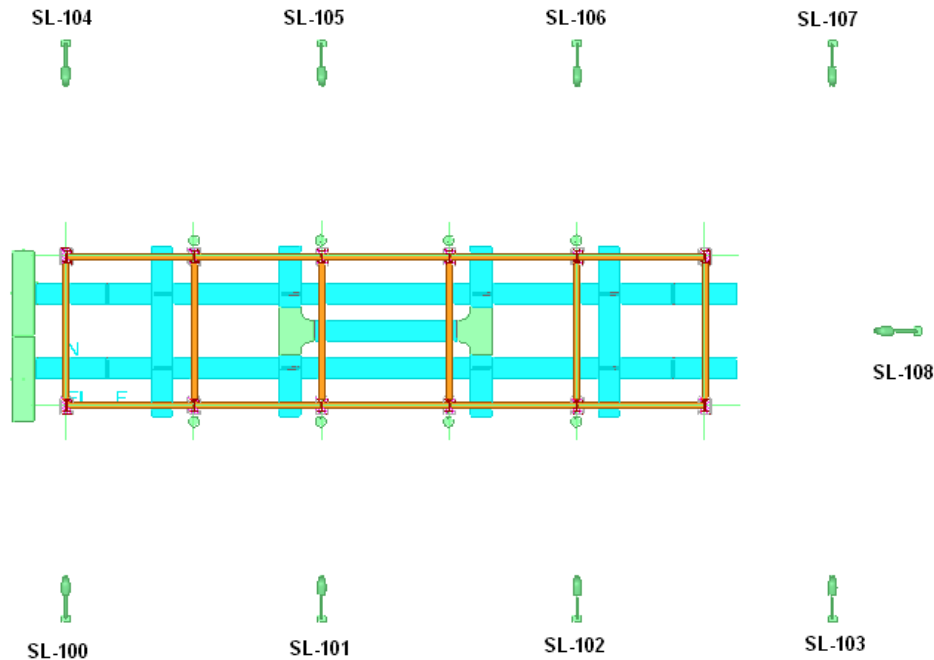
Plan View of Unit U07 - Street Lighting Fixtures
